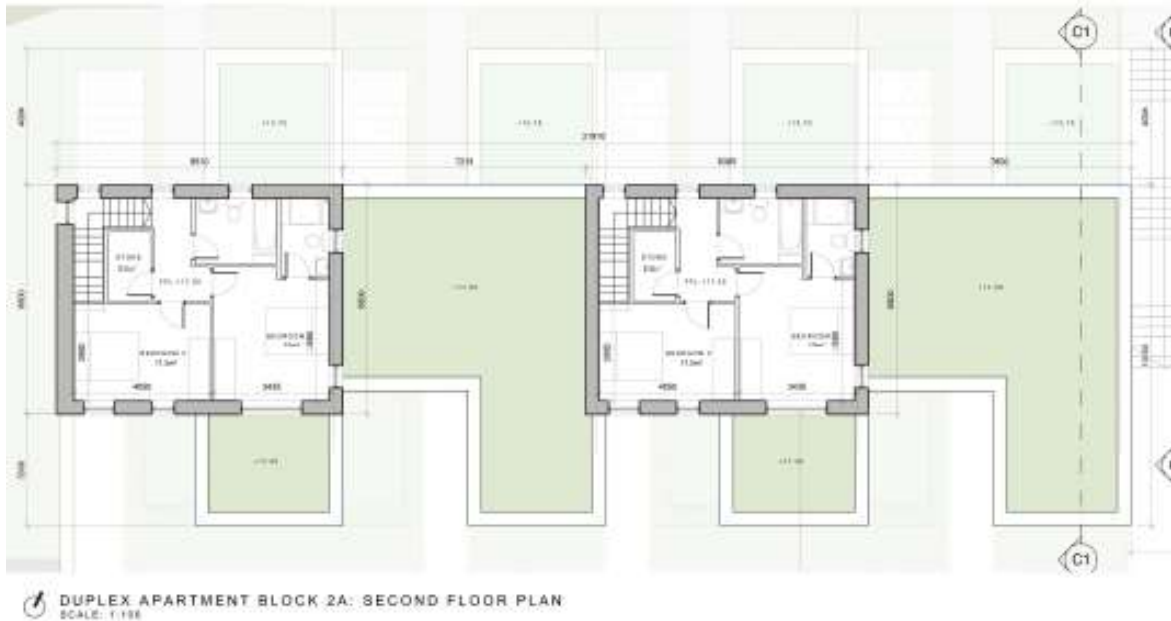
Duplex Apartment Block 2A Second Floor layout to be analysed using ADF method
